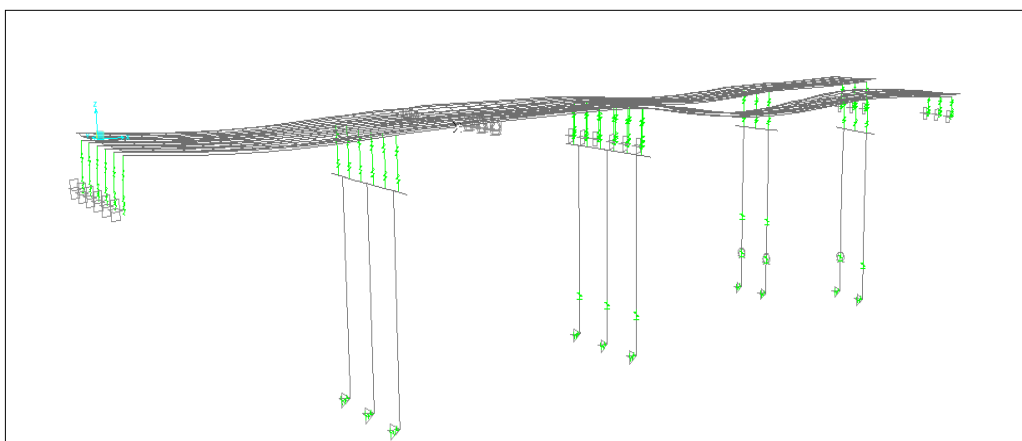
Deformation created in modeling bridge has a damper (in soft soil)
